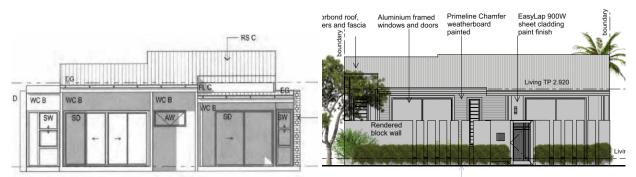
A & B: Approved and proposed Windsong Way (southern) elevation fencing not shown on stamped plans
